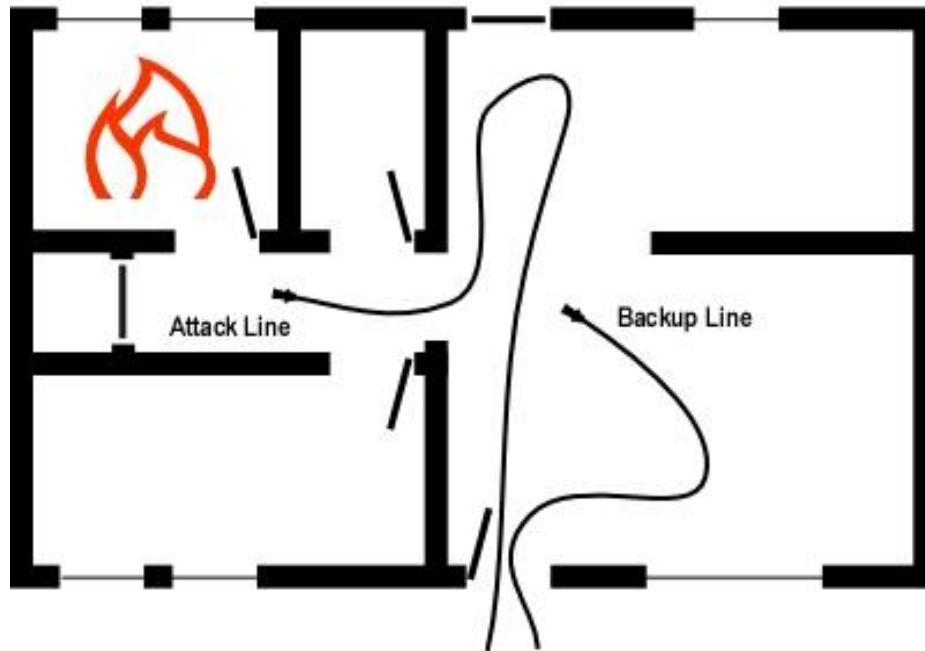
Typical floor plan of a drill tower (Source: Mion, 2008)
